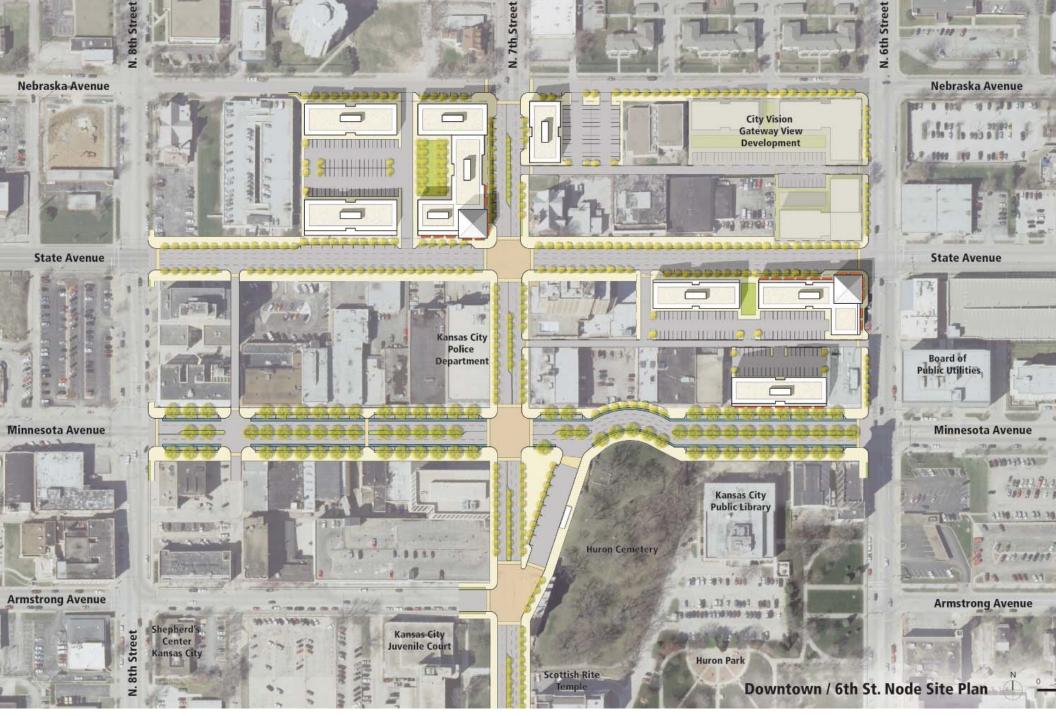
Illustrative Site Plan showing Dowtown / 6th Street and State Avenue Node
